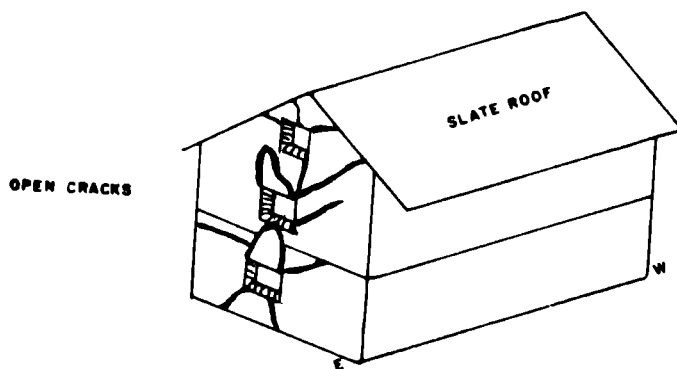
DAMAGE OF E-W ALIGNED KUTCHHA HOUSE - AGONDA
